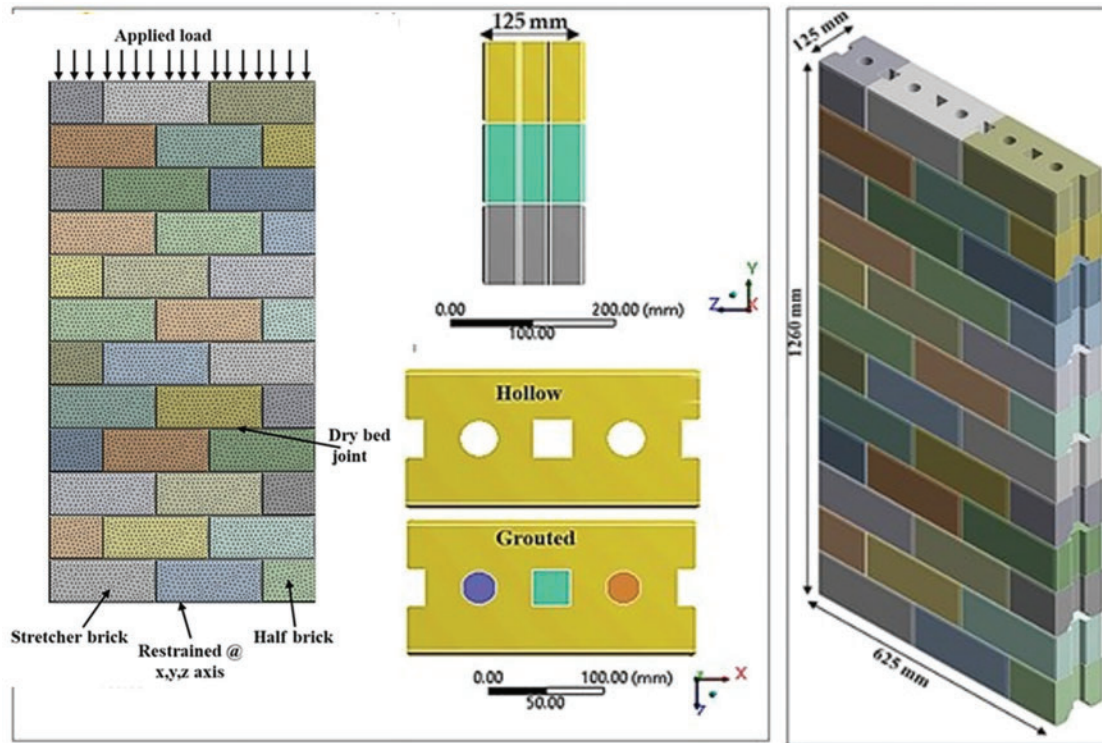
FE model configuration of rubberized concrete interlocking masonry walls under compression [90]. Adapted with permission from Ref. [90]. Copyright ©2022, MDPI
